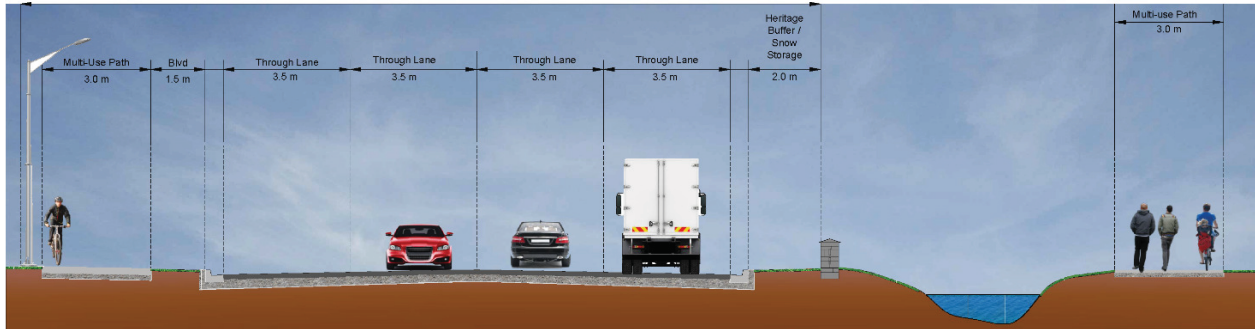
2017 EIS-Recommended Typical Section Adjacent to York District Lands
